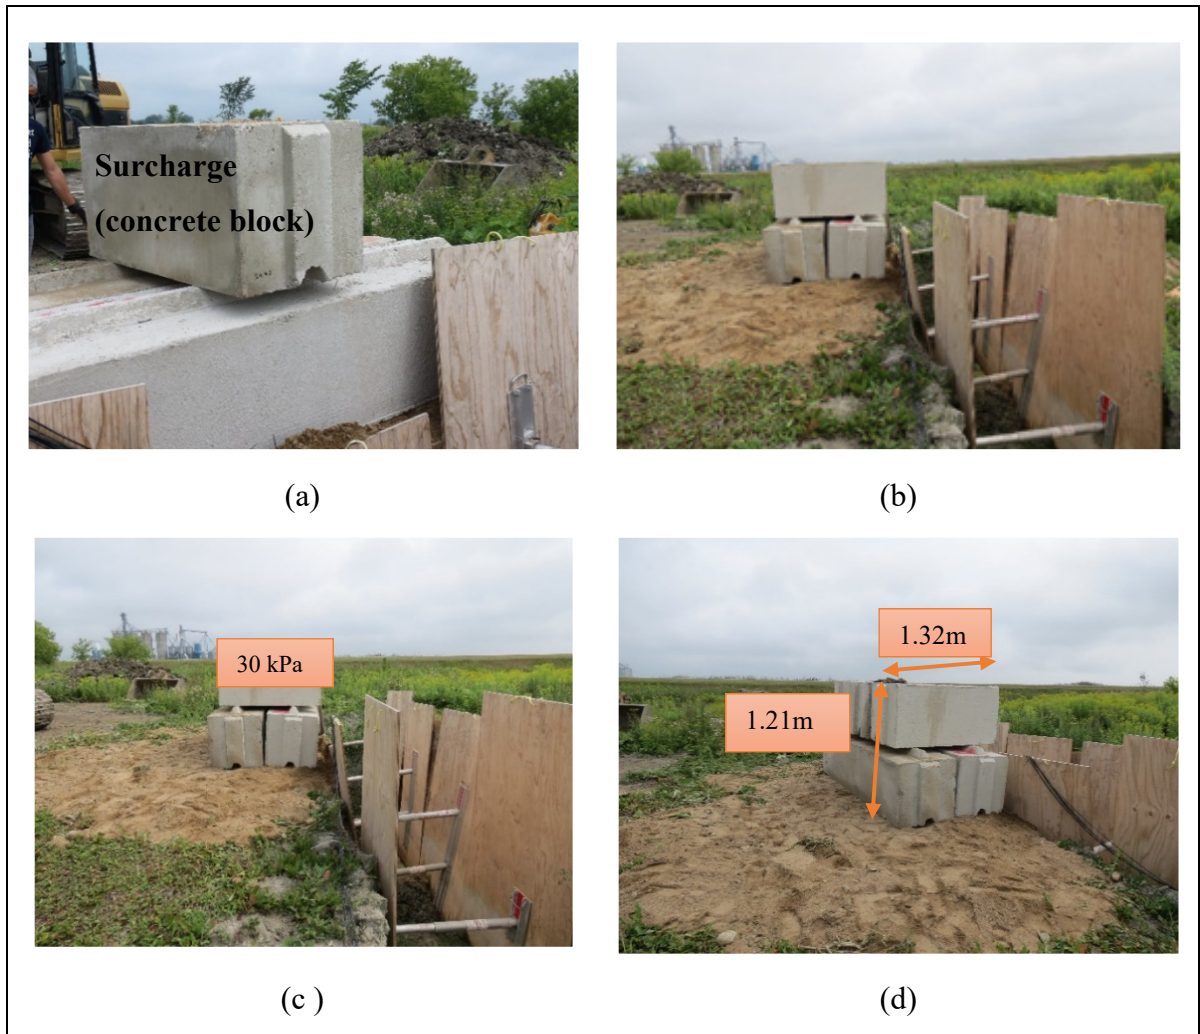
Concrete blocks (surcharge load) placing in a trench of soft and sensitive clay
